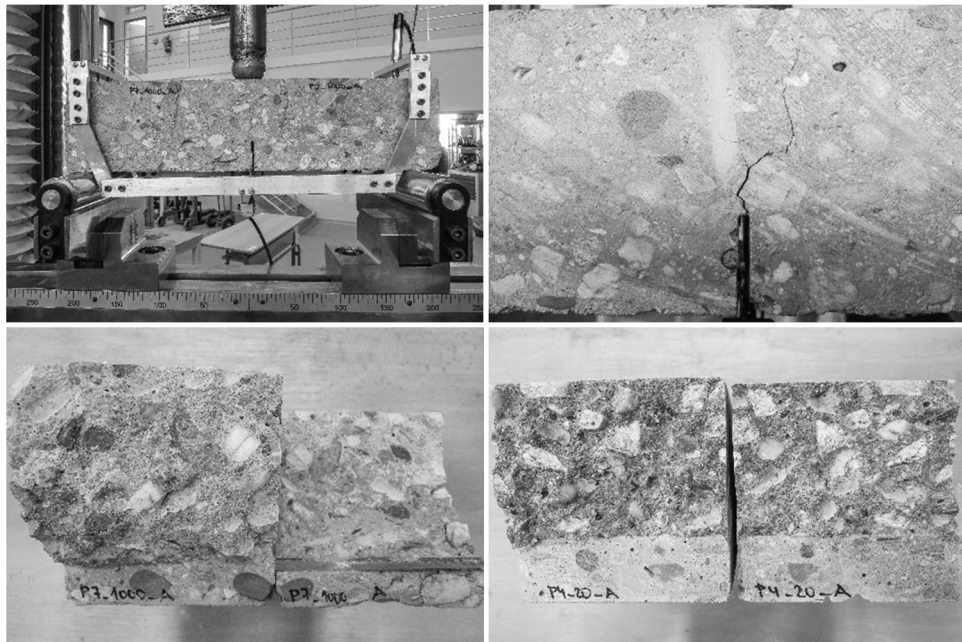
Illustration of a fracture test in the three-point bending configuration and detail of the crack path; examples of selected specimens after testing – the ligament of P7_1000_A (maximum furnace temperature 1000 °C) and P4_20_A (reference specimen)
